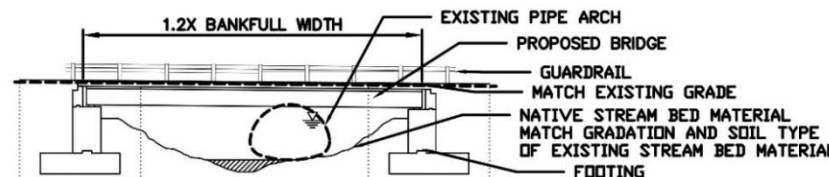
Typical detail of a bridge designed to meet the MA River and Stream Crossing Standards.
